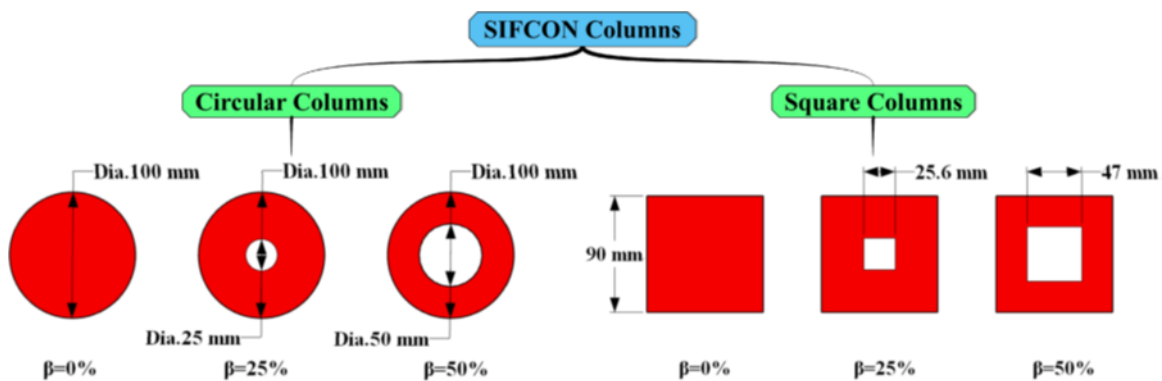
Cross Section Shape, Hollow Ratio ( $\beta$ ) % and Dimension of SIFCON Column Specimens by [47]
